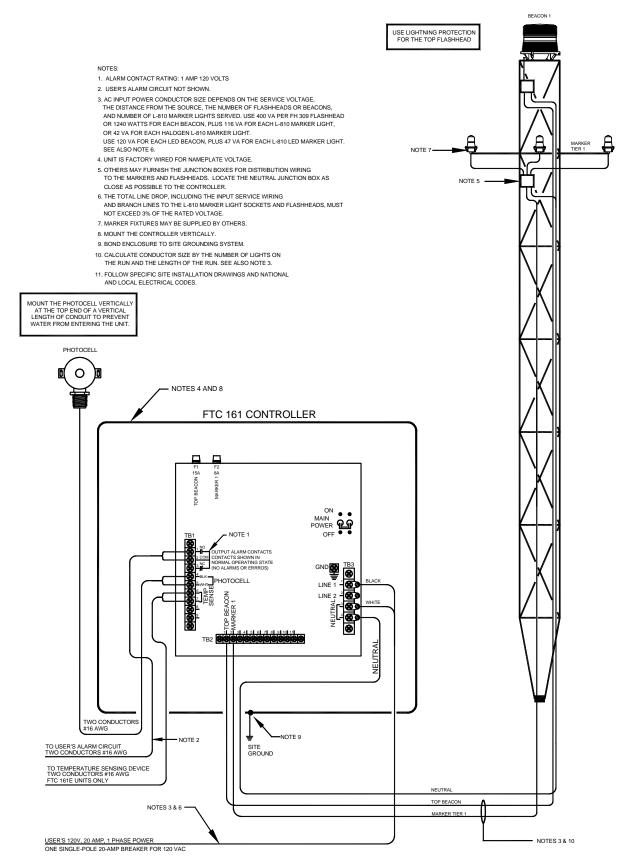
FTC 161 Controller Typical Installation Wiring
